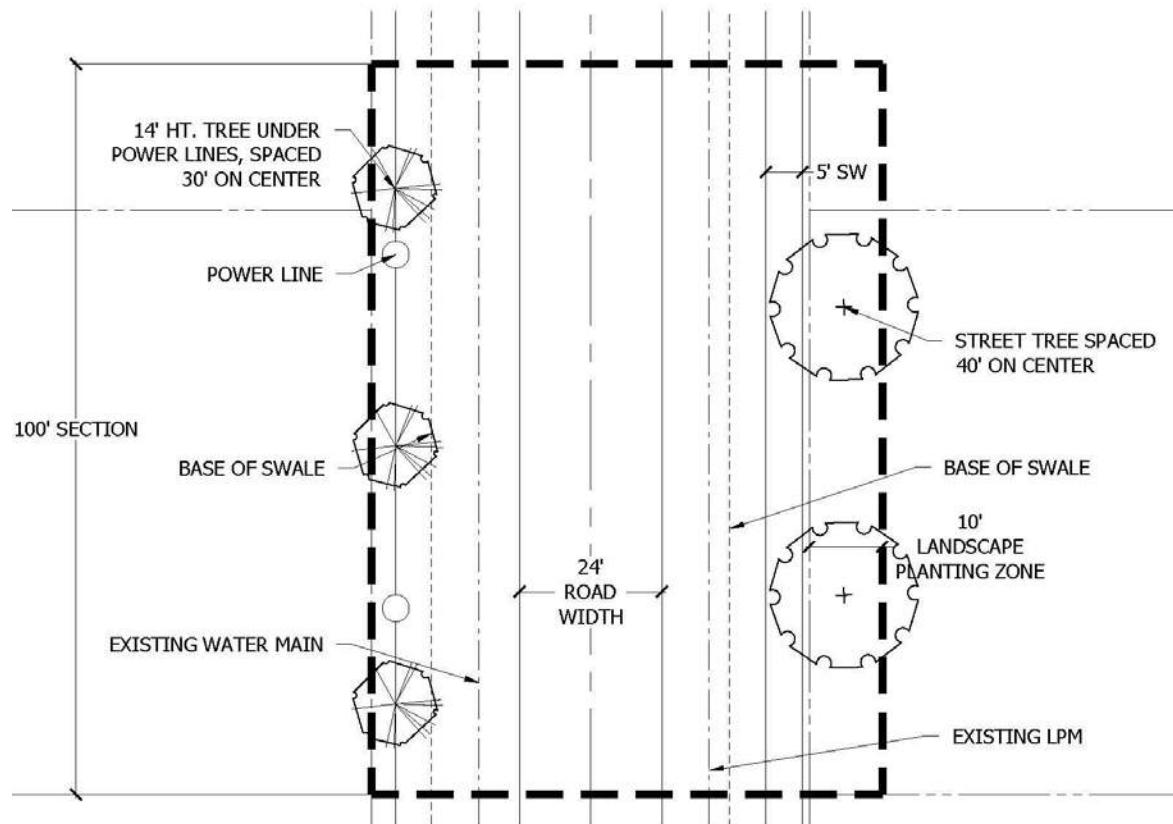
Typical 100-foot Plan View Section of 60-foot Right-Of-Way
